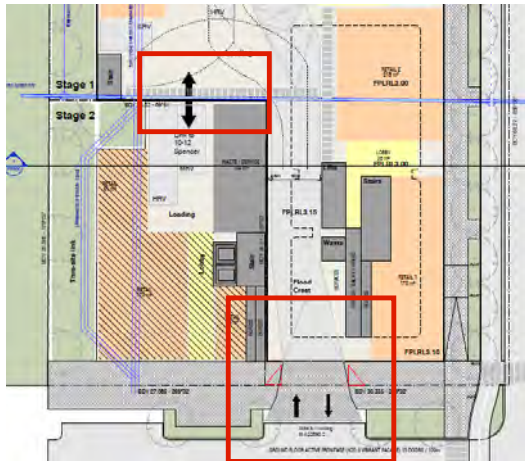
Indicative Development Concept Ground Floor Plan (access outlined in red)
